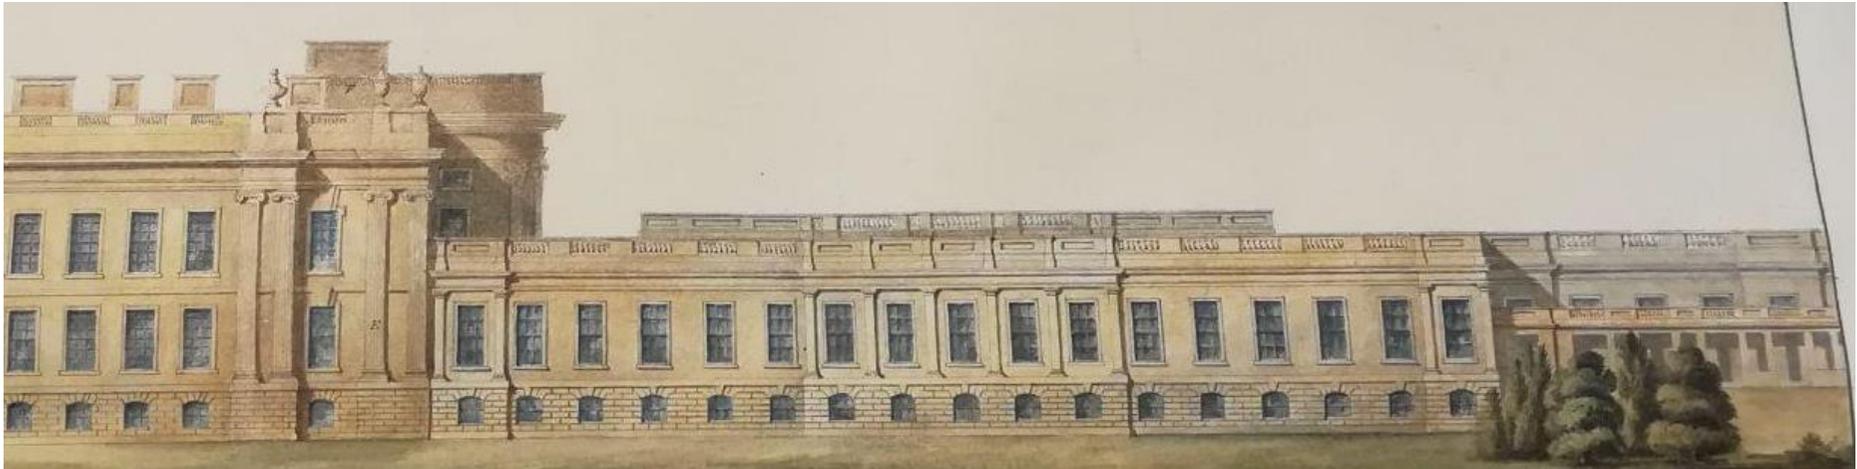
Detail from Wyattville's presentation drawing, titled 'Elevation of East Front'. The covered way leading from the Sculpture Gallery to the Banqueting Room building is likely to have looked very similar to the colonnaded structure on the right hand side of this image. (WY/T/2, 9).
